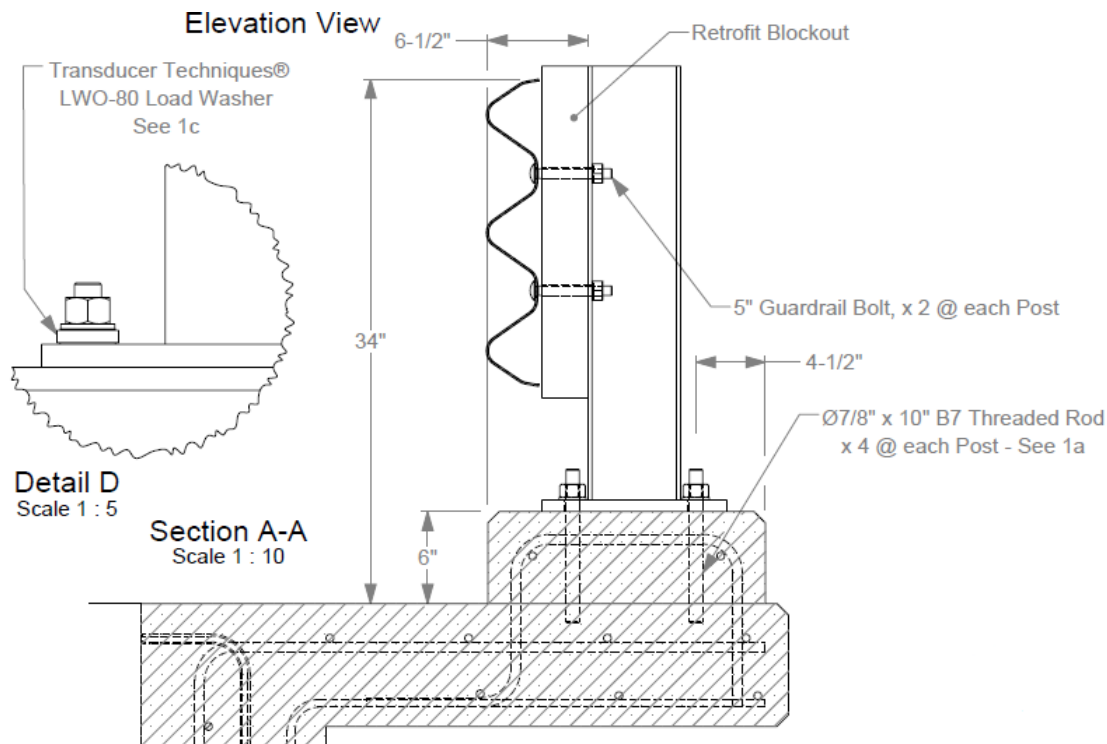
Details of Thrie-beam Bridge Rail Retrofit ^[2]
